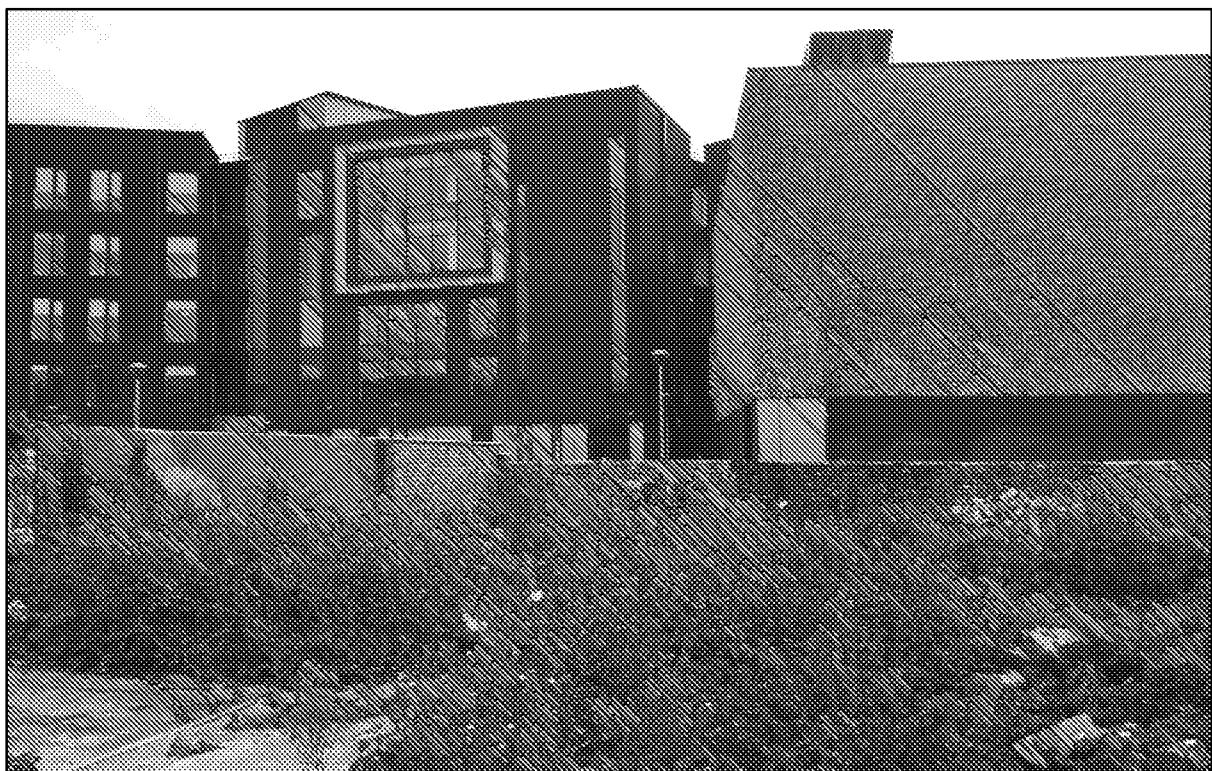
The newly built flint wall surrounding the site, along with the new University Campus Building adjacent, completed within the last 18 months.
